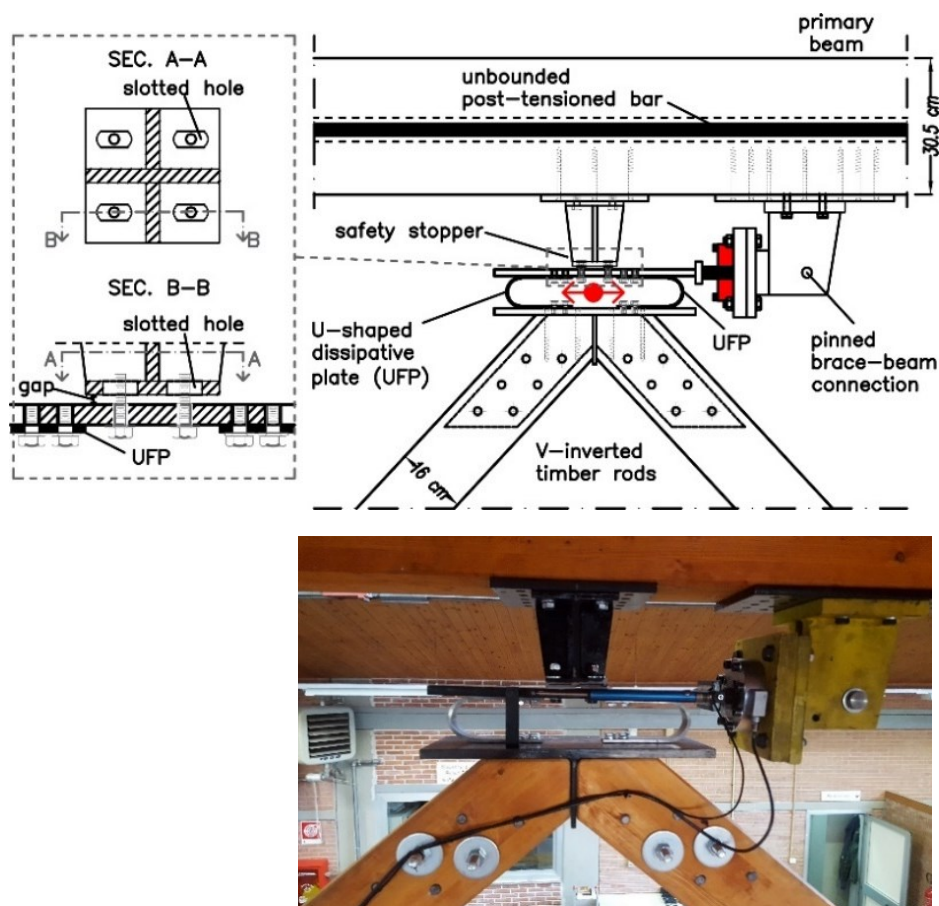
Details and photographic view of dissipative bracing and UFP devices connections
